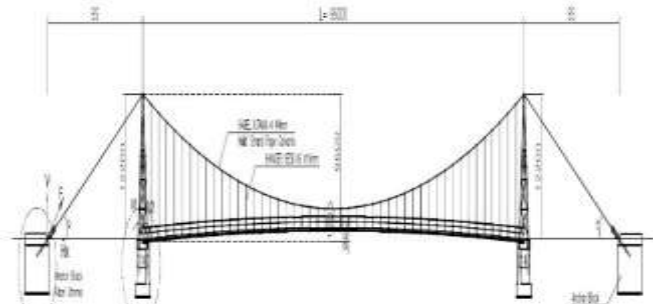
Longitudinal Section of Suspension Bridge L = 96.00 Meters
